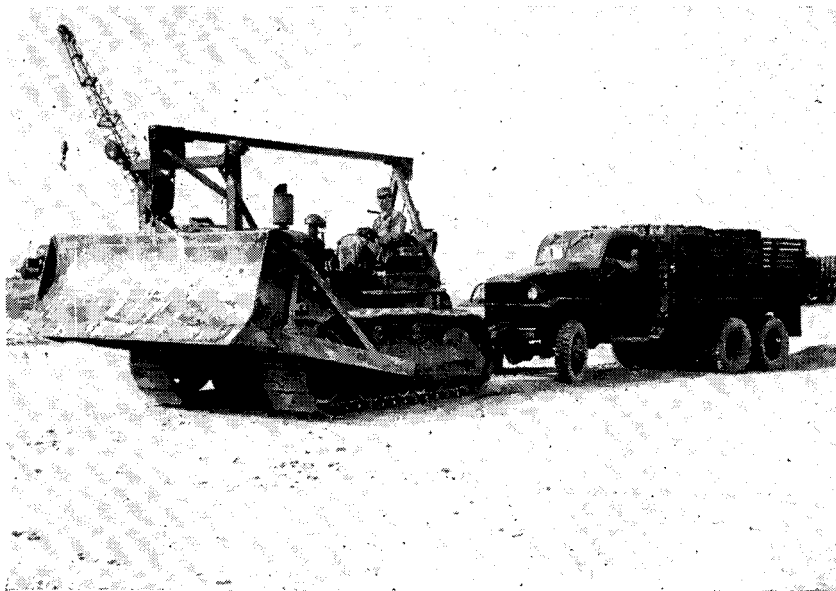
Use of a bulldozer to tow trucks out of soft sand.
